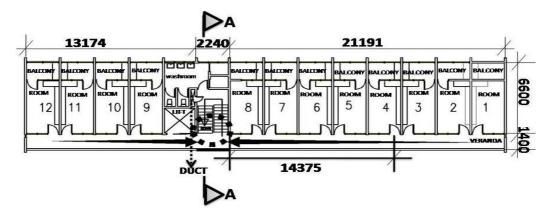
Typical floor plan of type $B\ (1)$ and Type $C\ (1)$ blocks showing existing stair (All dimensions in millimetres)
